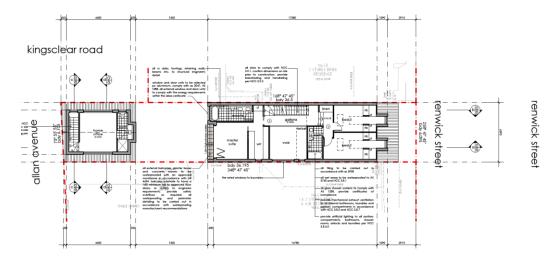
Proposed first floor plan demonstrating the large internal void at the centre and rear balcony
